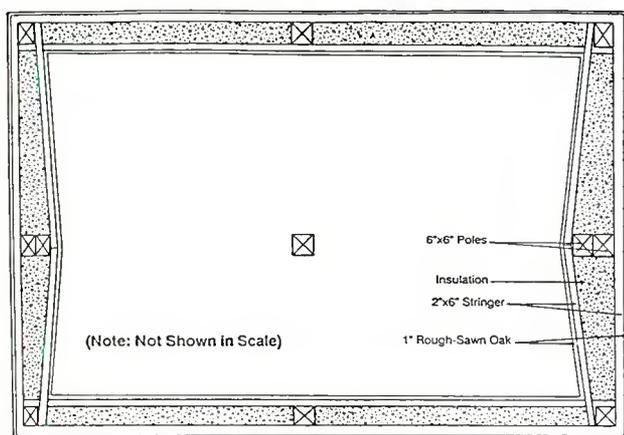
Angling of interior walls. Note an additional set of poles along the sidewall.
